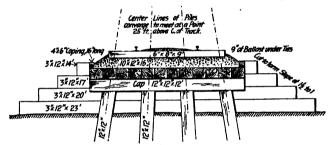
Ballasted Culvert; Southern Pacific Ry.
